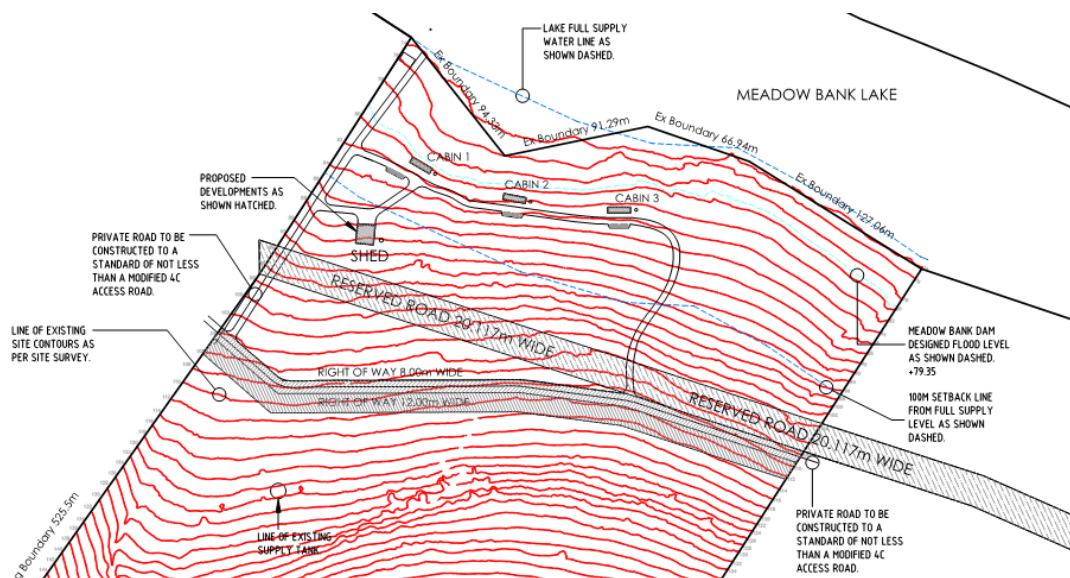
Plan of proposed development (Source: DA2022/05 StudioKo architecture design & drafting)
